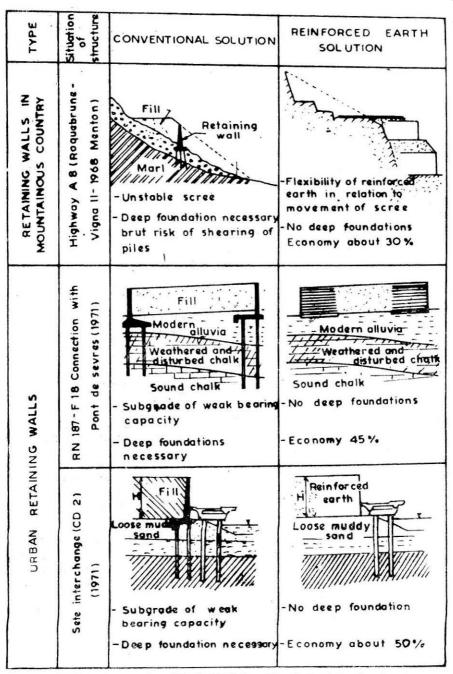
Examples of Typical Reinforced Earth Retaining Structures built between 1968 and 1972
